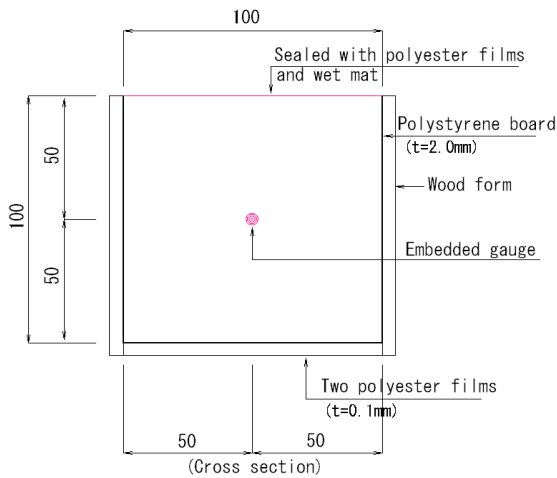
Details of early age shrinkage specimen (unit: mm); *t*: thickness
